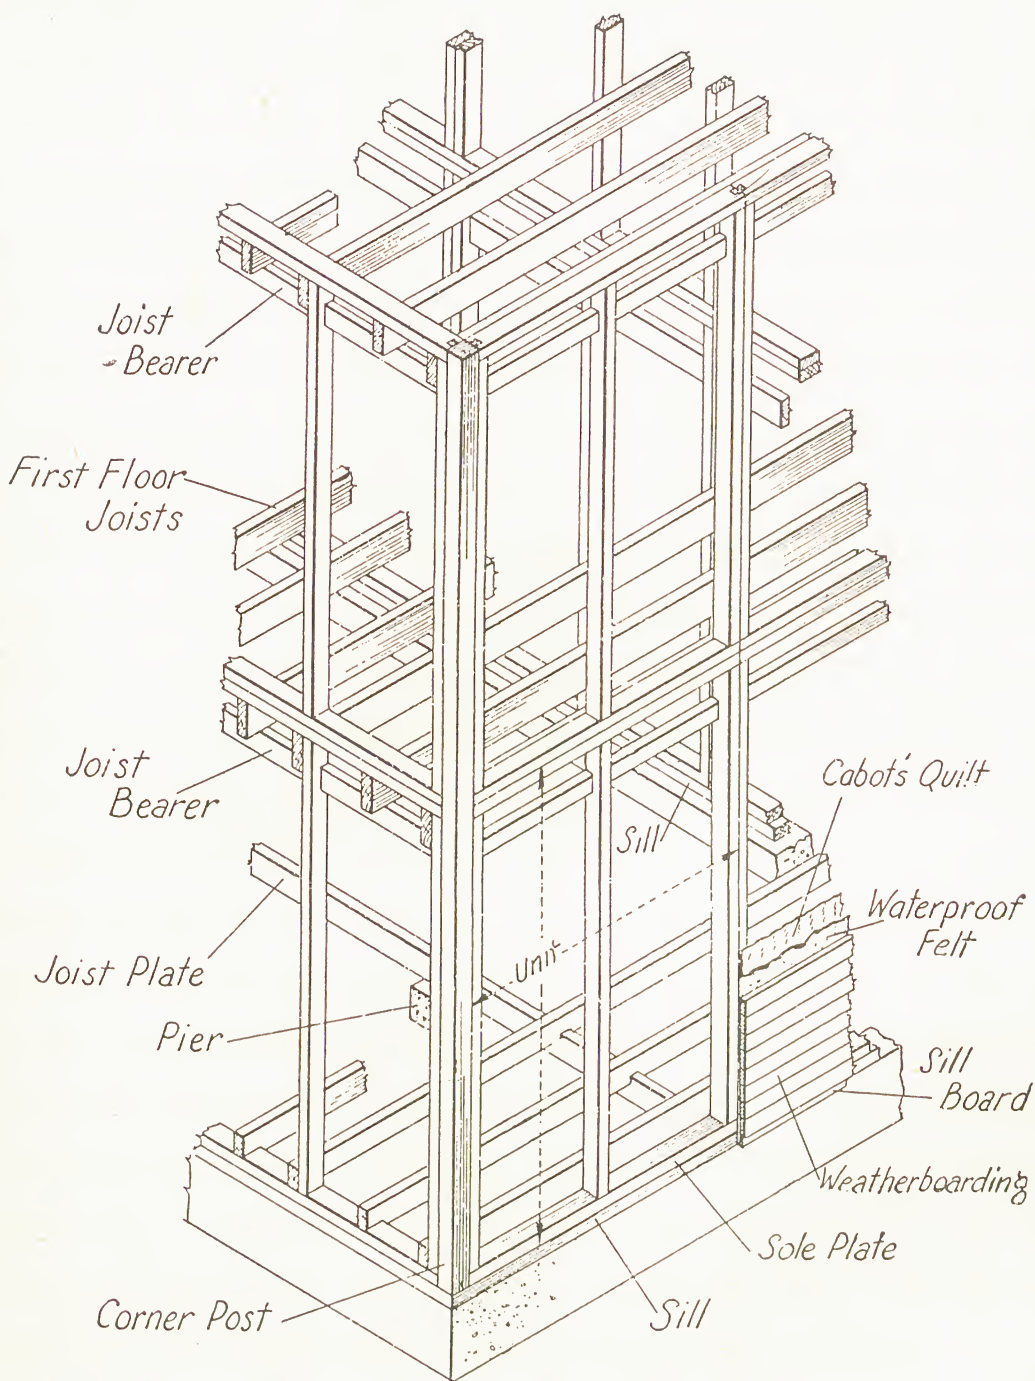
Unit frame construction. Partly prefabricated—main skeleton frame is erected on site—workshop-assembled panel frames are then fixed. (Courtesy Timber Development Association.)
